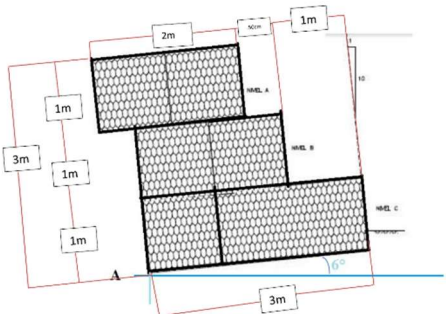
LARGE TRENCH BREAKER. FOUNDATION WITH POSITIVE ANGLE.
